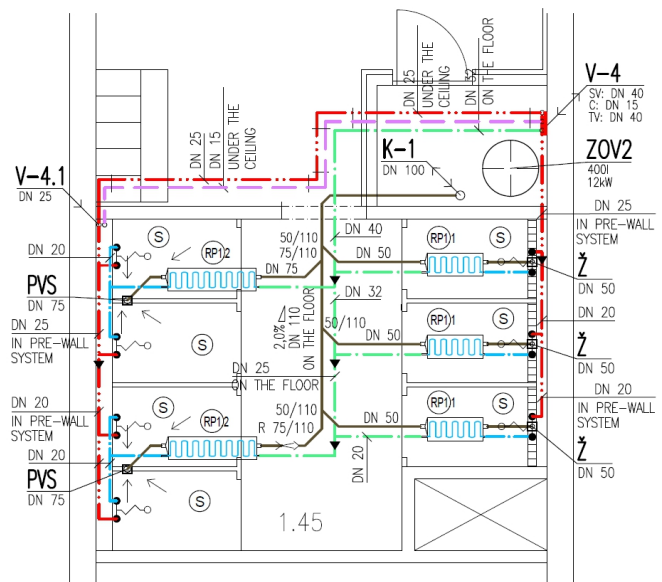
Floor plan with alternative solution of recovery of waste heat using a panel with stainless steel heat exchanger
